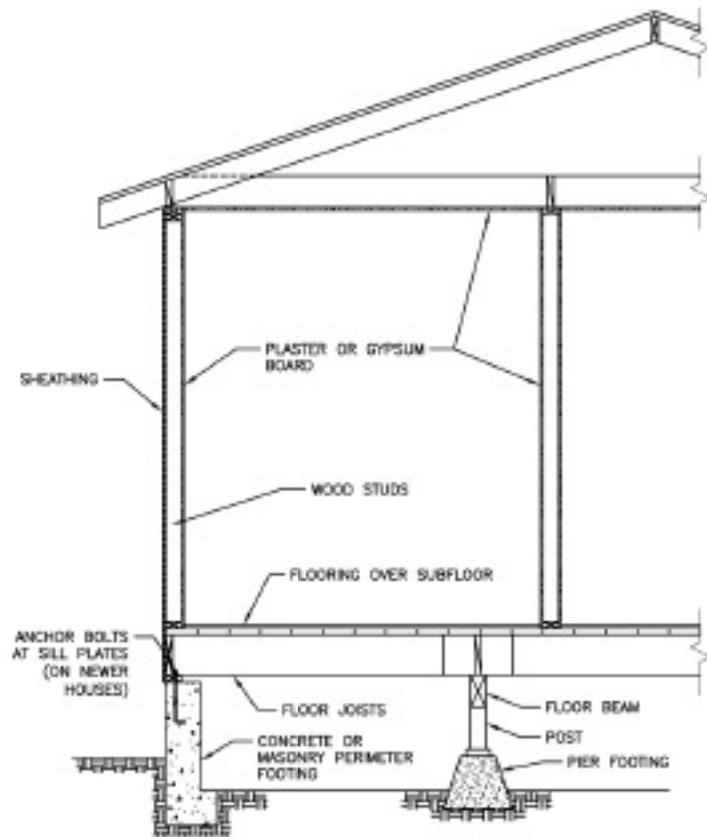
Section through a variation of the basement house where the perimeter foundation walls enclose a crawl space (from ATC, 2002).
